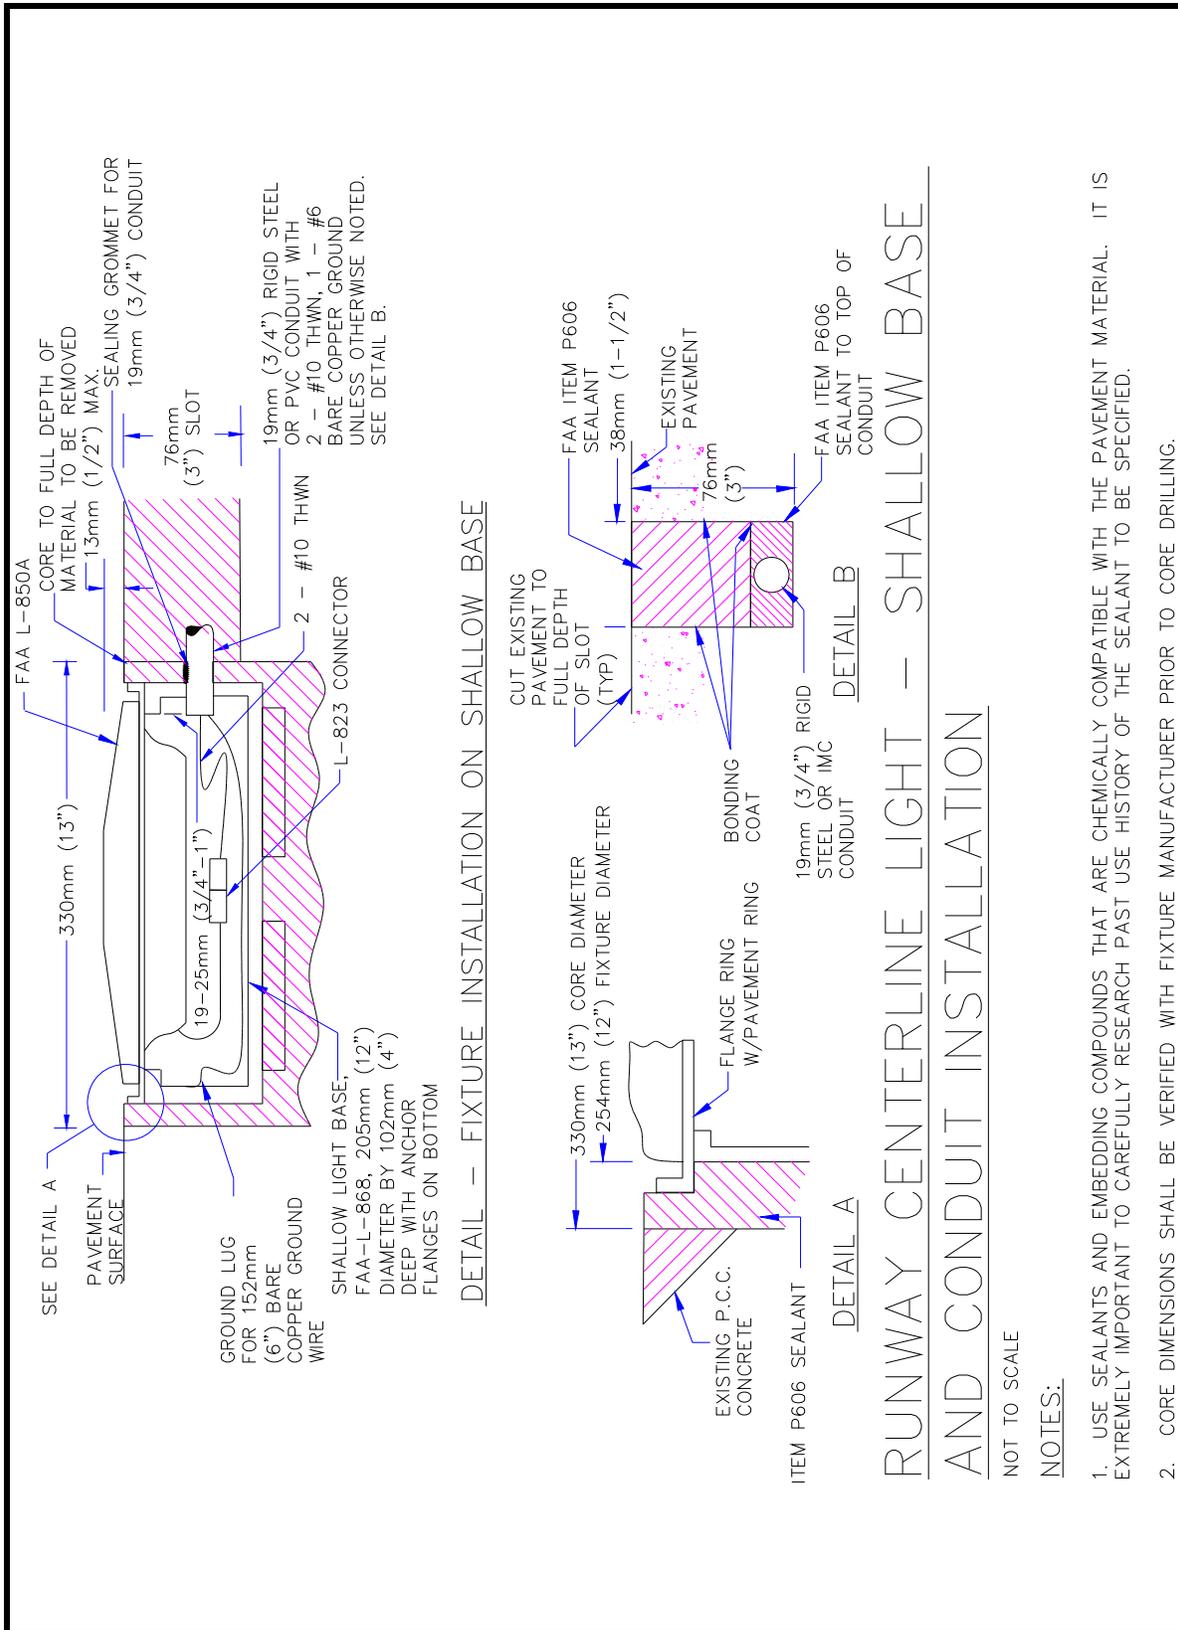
Runway Centerline Light – Shallow Base & Conduit Installation.
